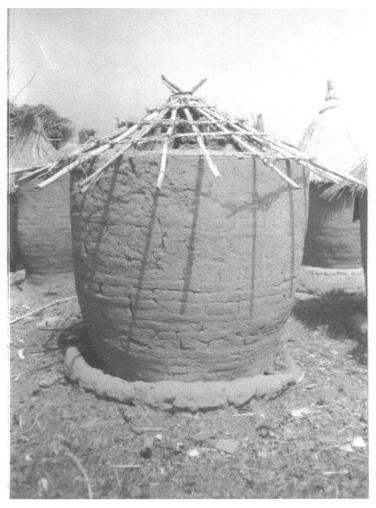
SHOWING EFFEC ON FOUNDATION, WALL AND ROOF CONSTRUCTION
